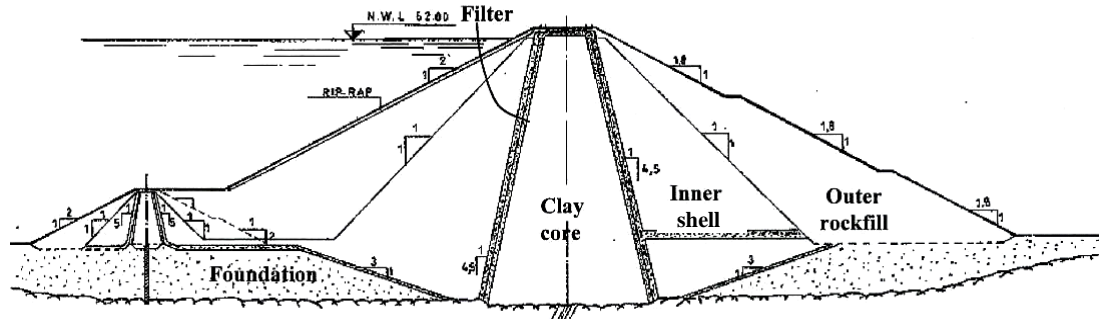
Cross-section of Beliche dam (Caldeira & Brito, 2014)
